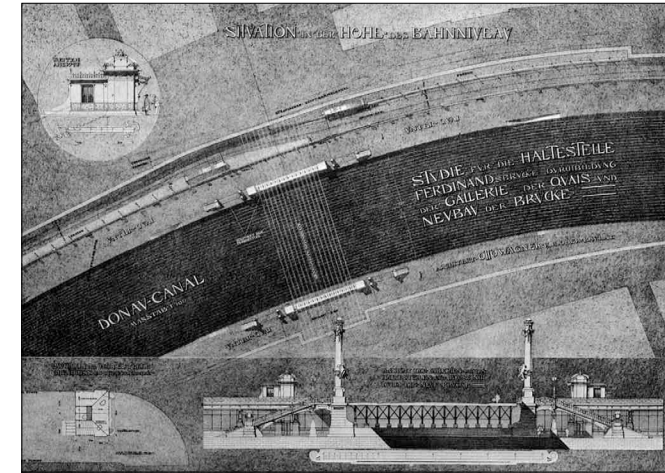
/ Ferdinand's Bridge - Situation and Section , Railway Level
